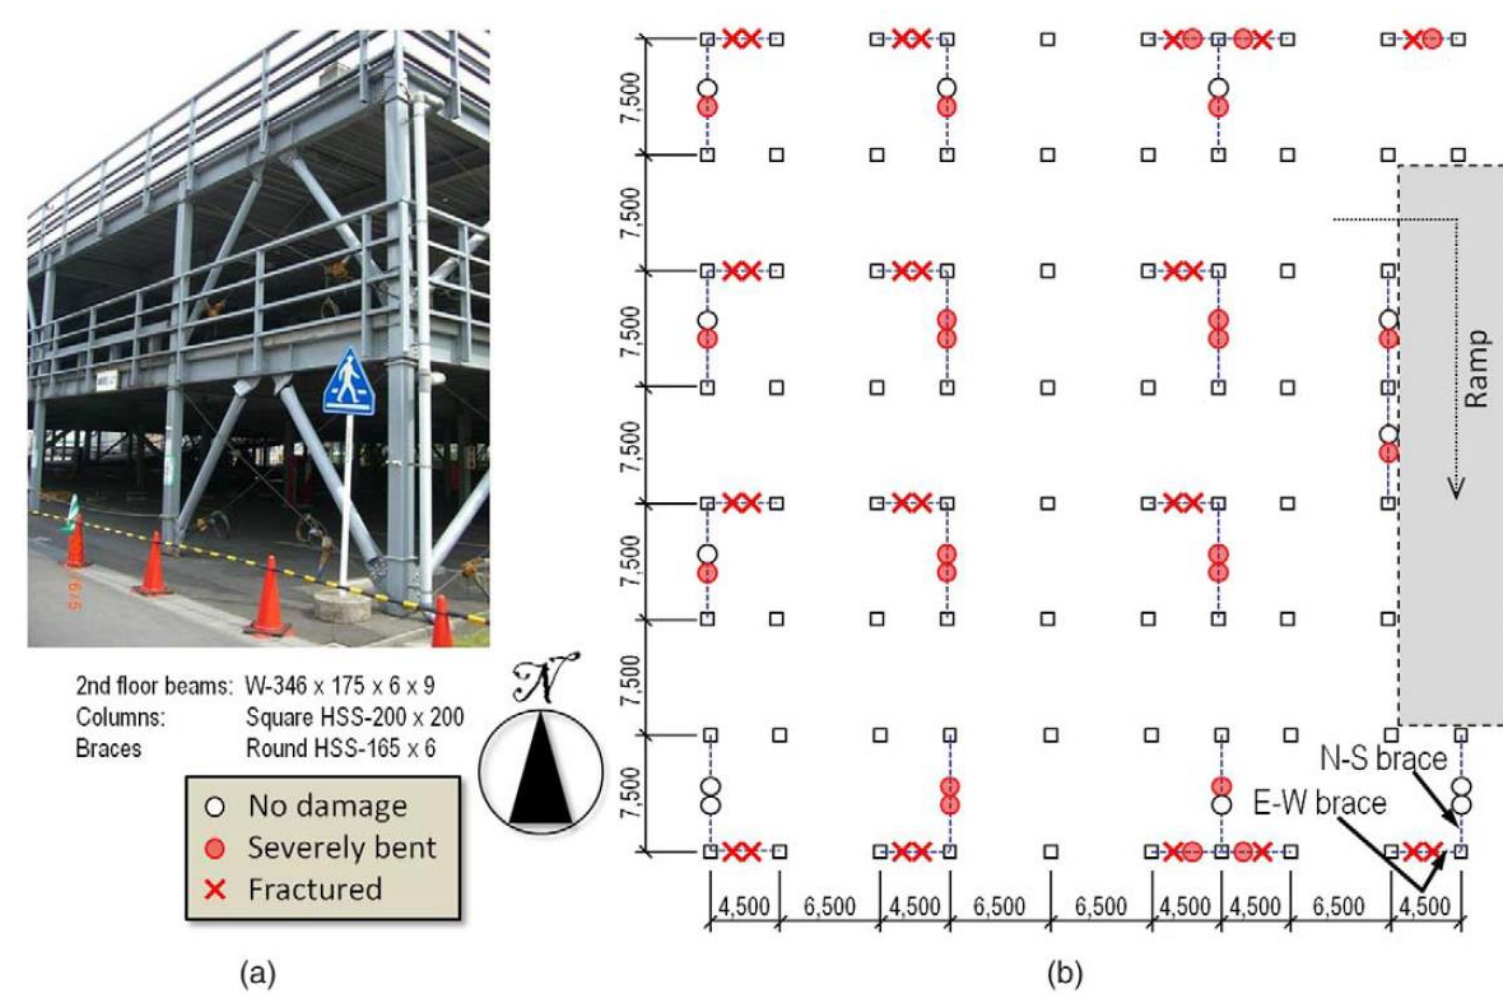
Parking Garage: (a) Photo; (b) Floor plan
